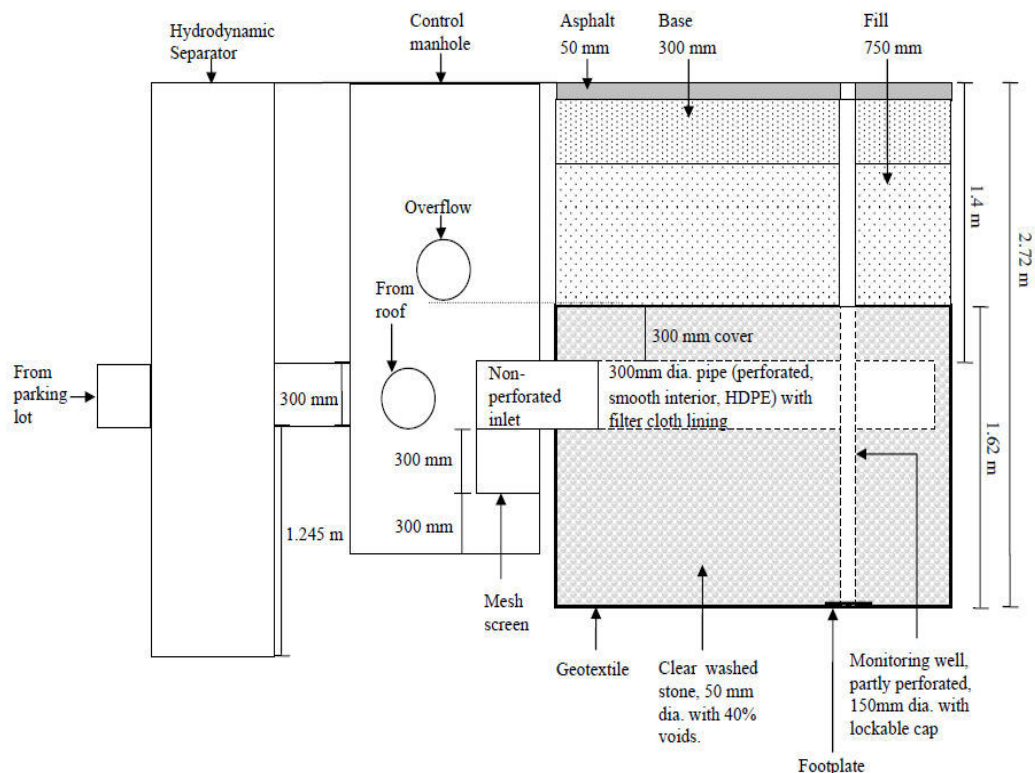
Typical cross section of the infiltration trench receiving road (1500 m<sup>2</sup>) and roof runoff (500 m<sup>2</sup>) (Seters et al., 2013).
